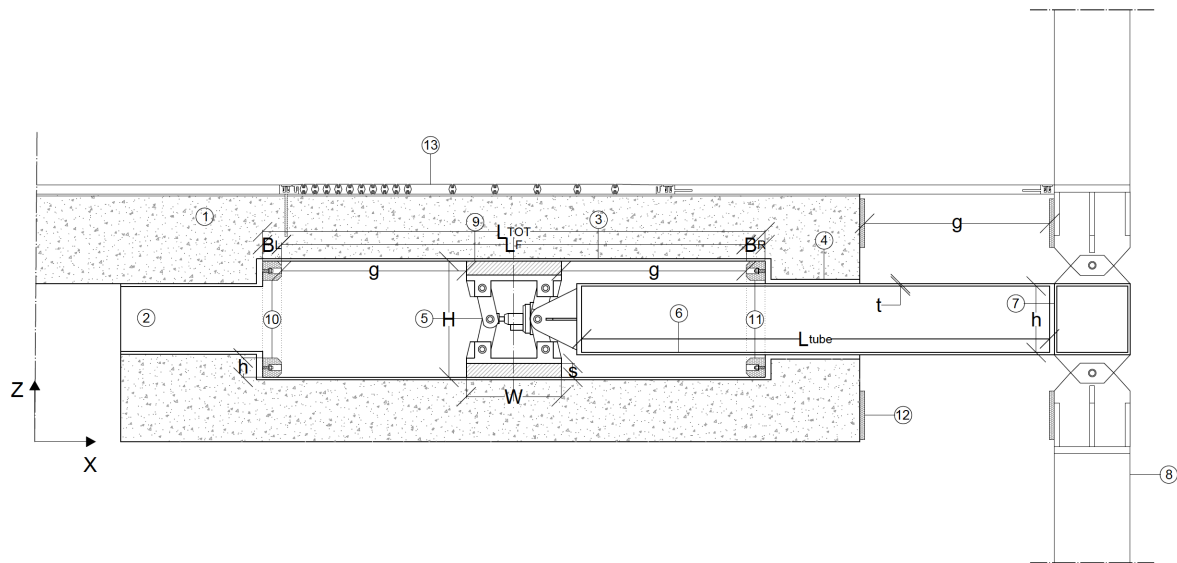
Layout proposal for the connection system consisting of a dissipative sliding device and two-sided rubber bumpers incorporated into the MF design
